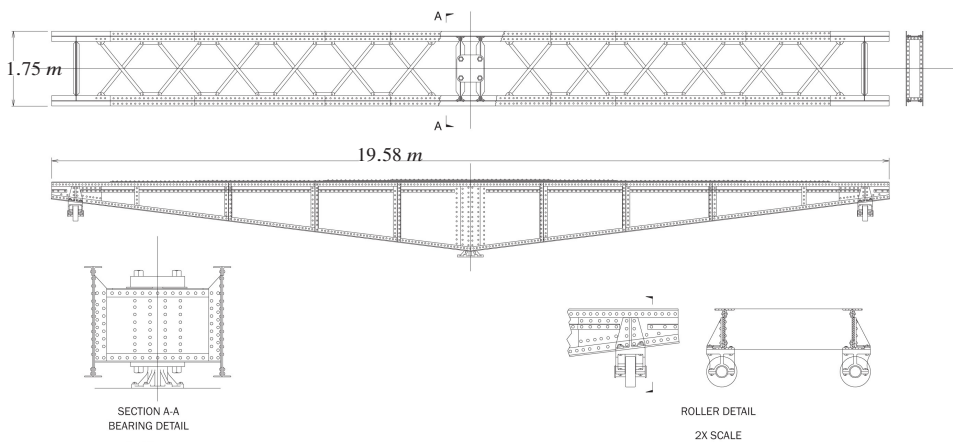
Drawing of a railway turntable⁹ - dimensions converted to meters by the author
